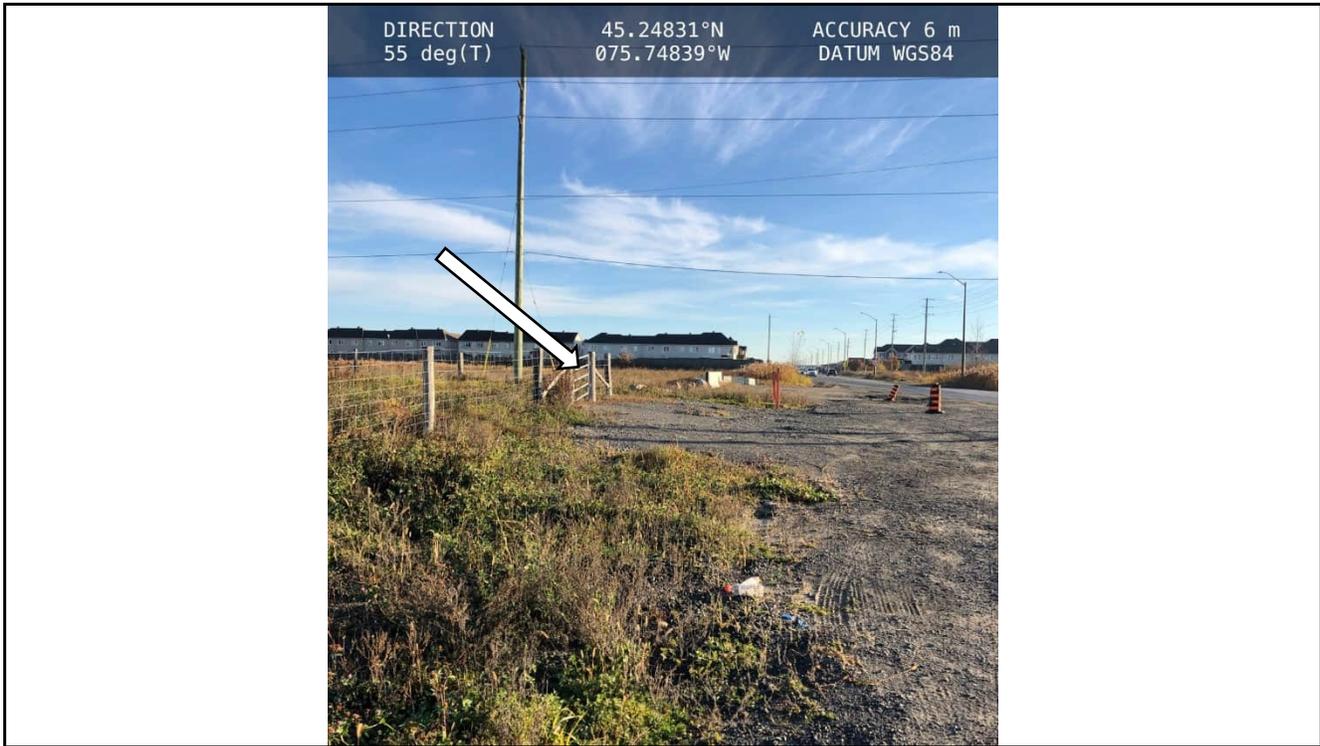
Gated Site entrance southeast portion of the Site with access via Cambrian Road, facing east.
